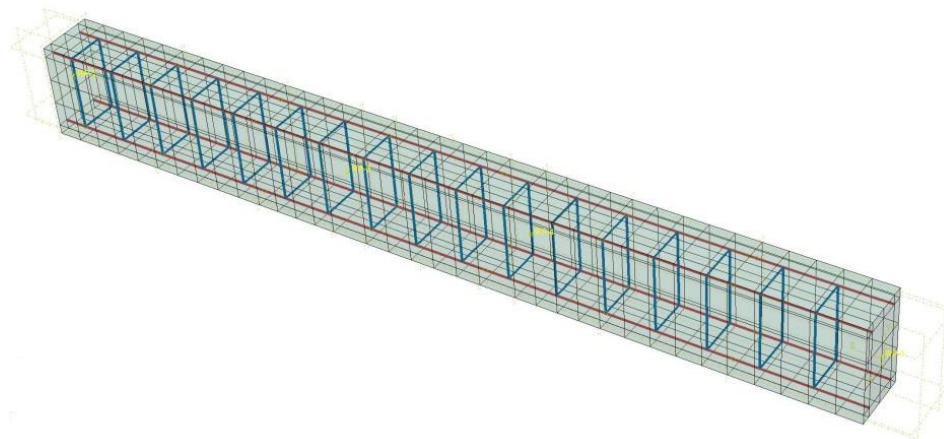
Calibrated CFRP reinforced beam in detail geometry.
